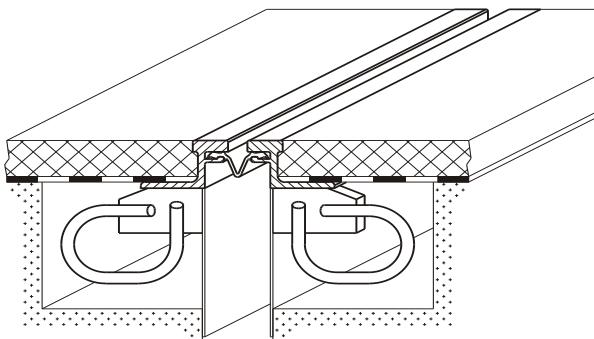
Single gap joint with standard loop anchorages in normal concrete and asphalted road surface – cross-section
